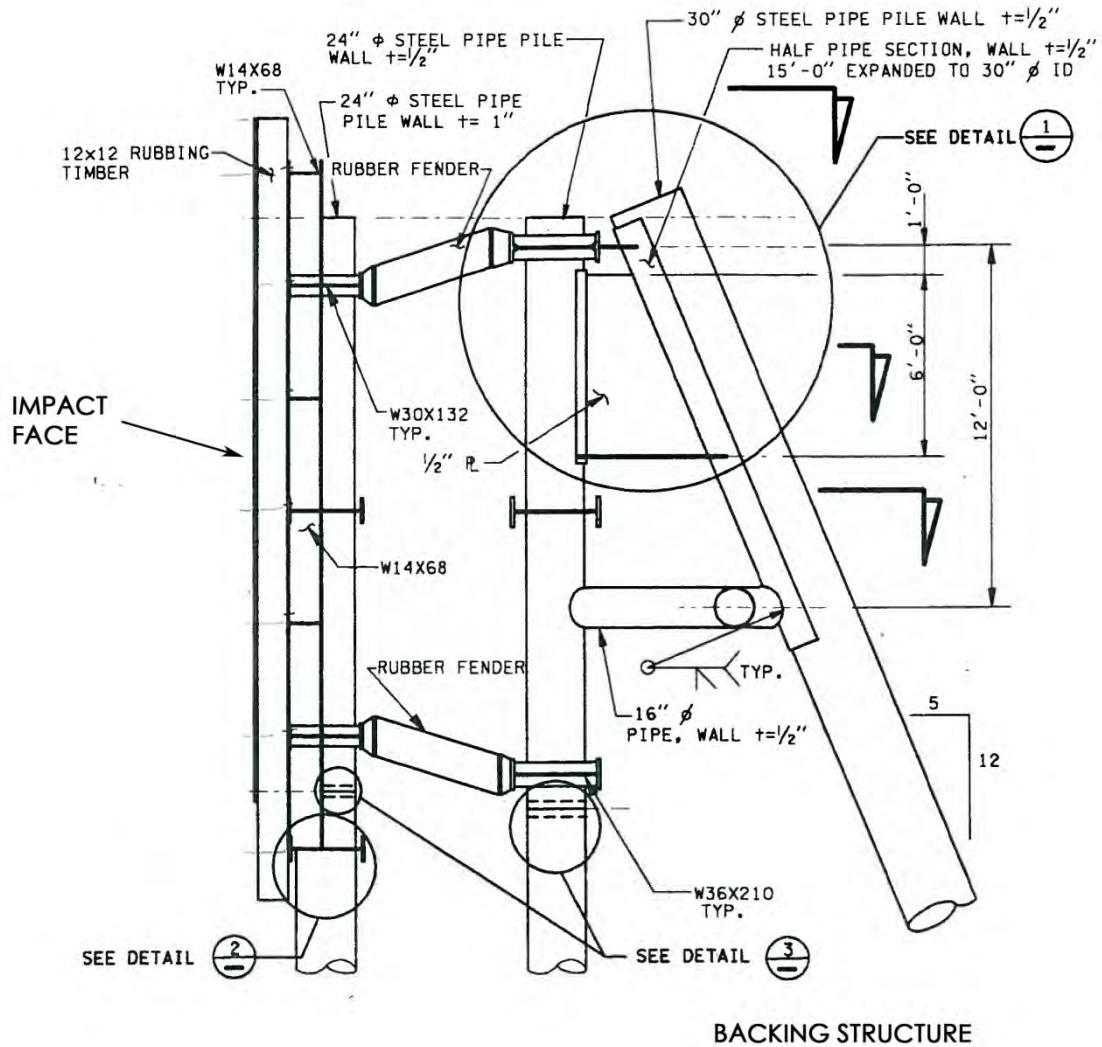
Wingwall as built, elevation view; courtesy WSF
